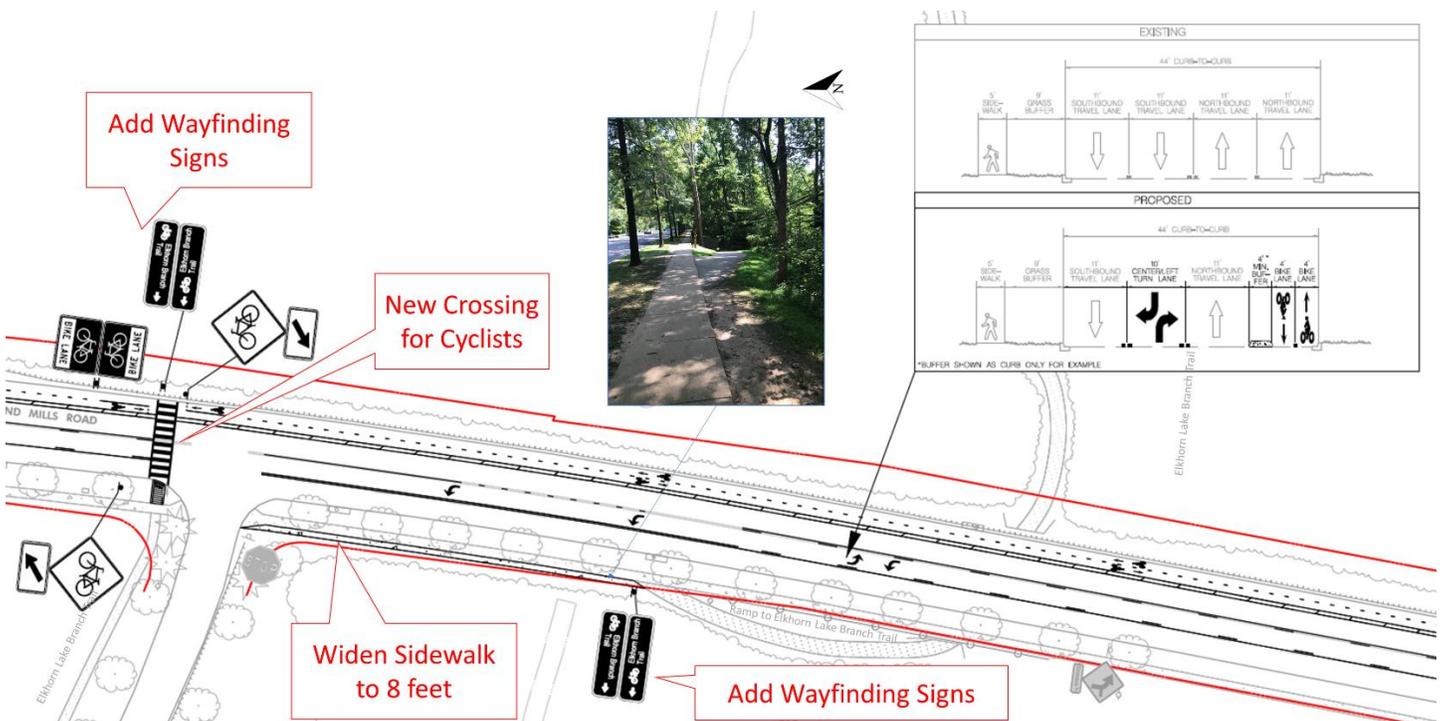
Sidewalk expansion along the west side of Oakland Mills Road
